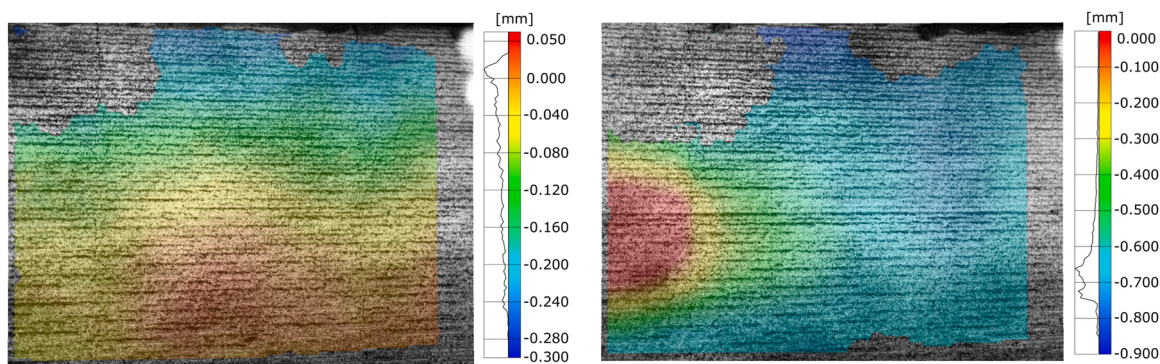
Displacement perpendicular to the wall surface [mm] obtained by optical measurement system ARAMIS of first wall element (left) and second wall element (right) right before compression failure.
